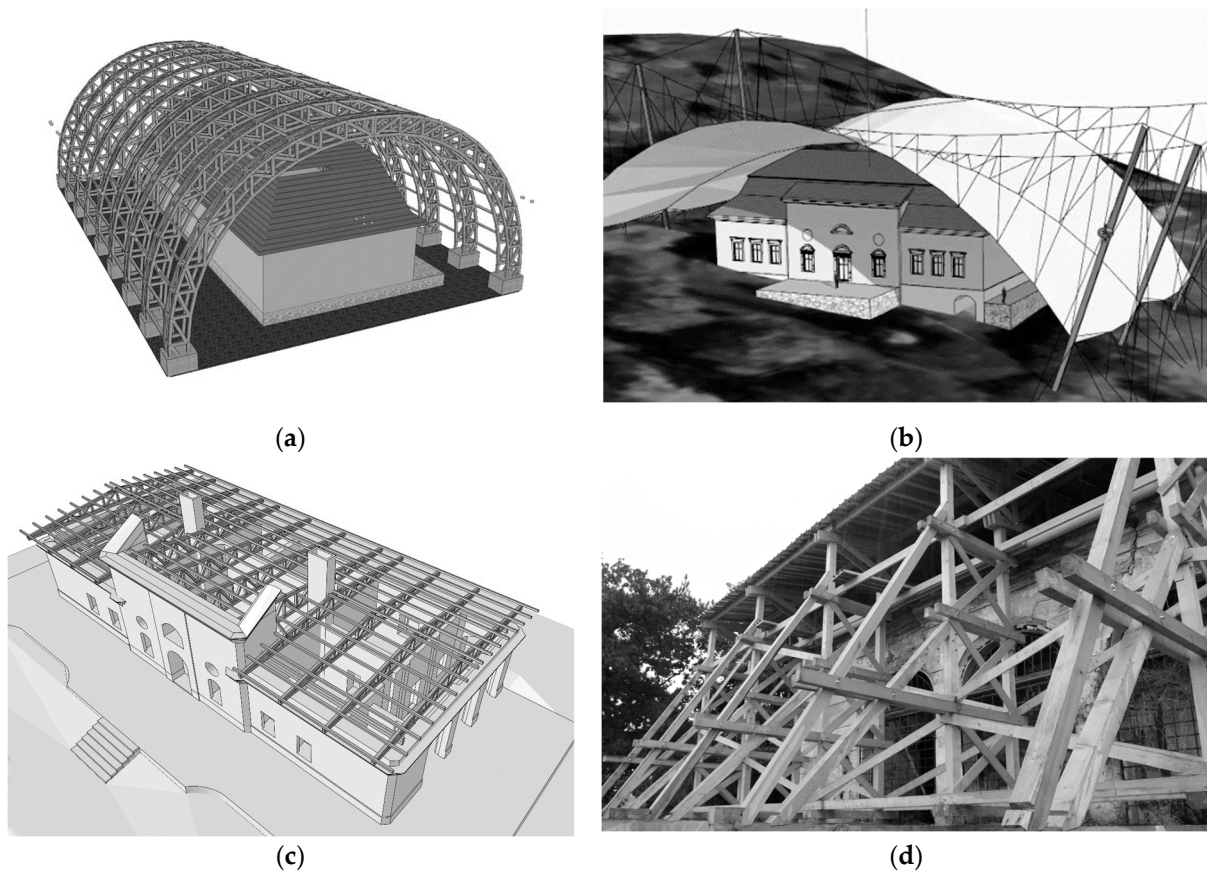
Teleki mansion from Comlod. Proposals for the temporary roof structure. (a) Arched timber trusses; (b) Tensile structure; (c) Trusses timber structure resting on the original structure; (d) Timber trusses resting on additional supports.
